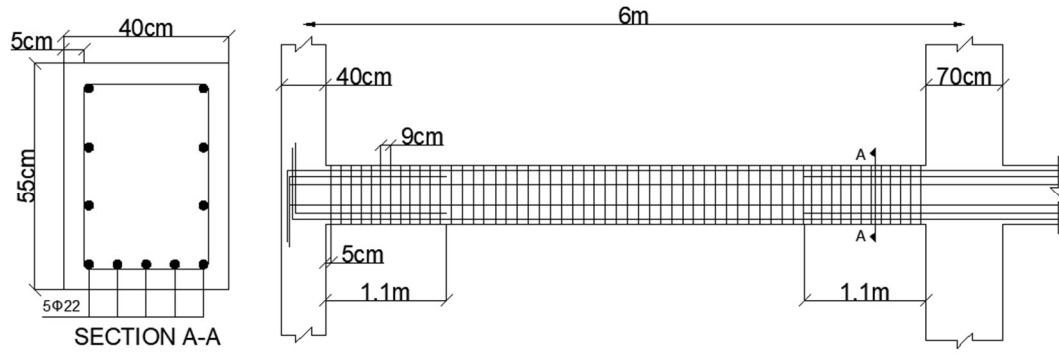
The section and reinforcement detailing of Type 1 beam in the MRF design
